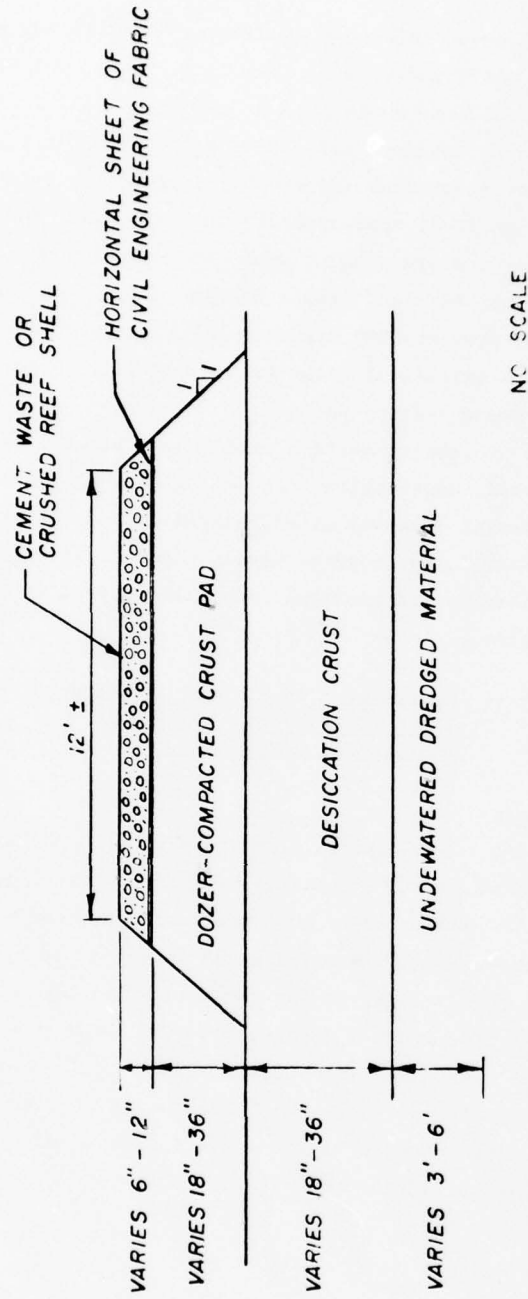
Typical cross section of haul roads constructed on dewatered dredged material crust
